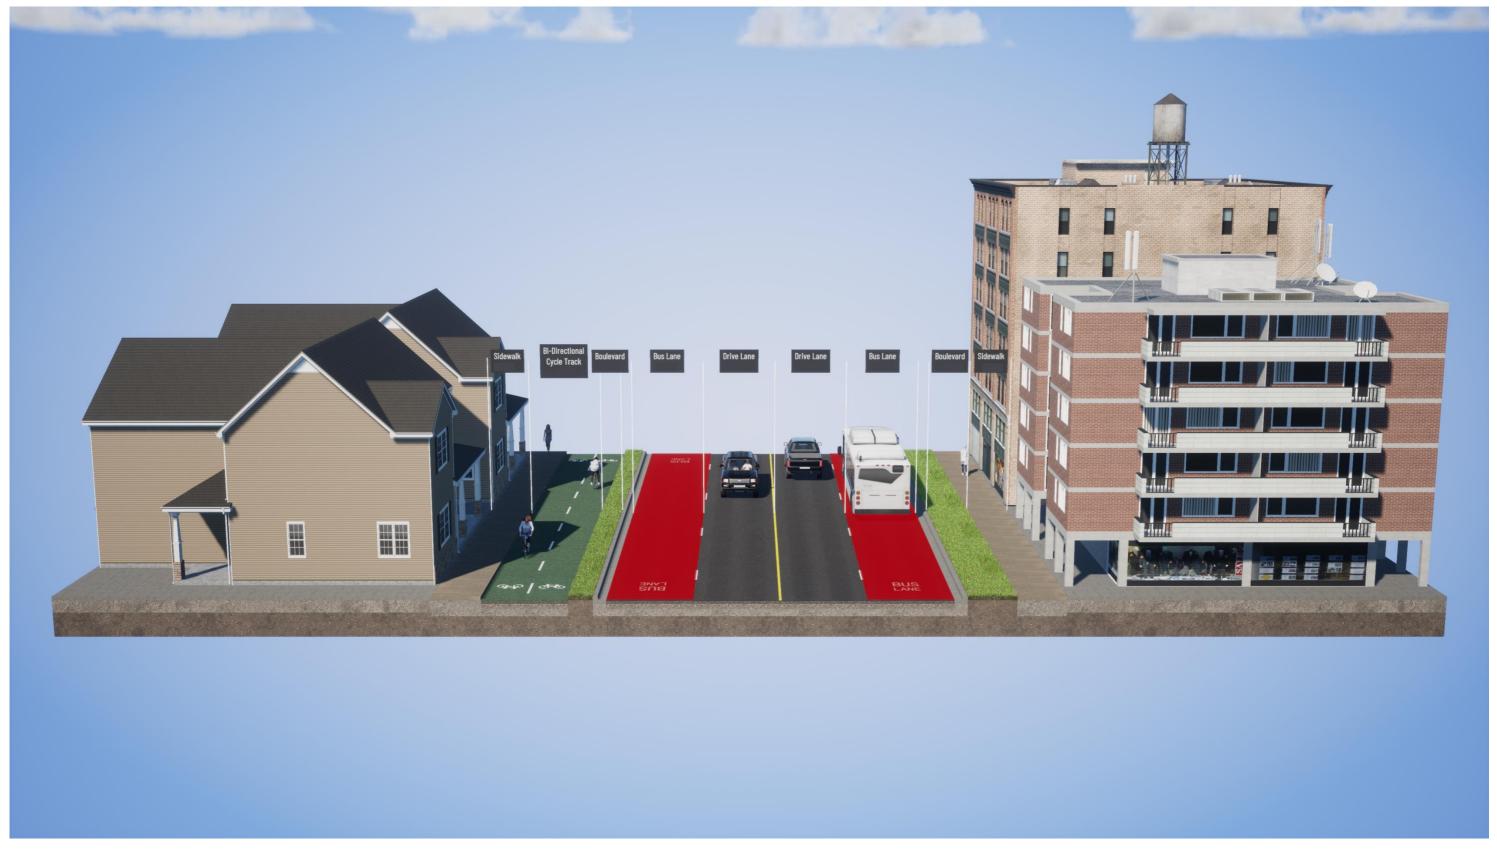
Recommended Typical Cross-Section for Victoria Street North
